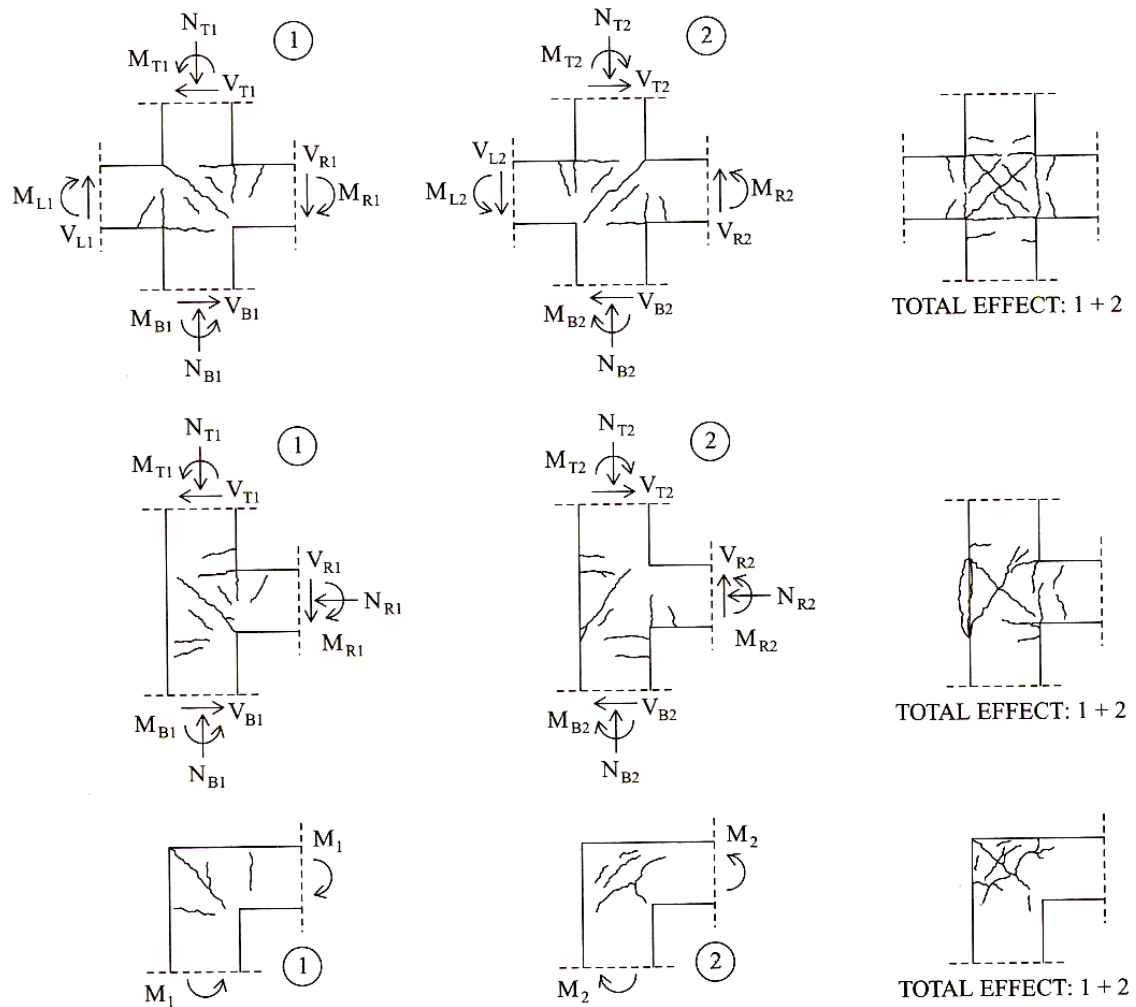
Lateral damage patterns of beam-to-column and column-to-foundation joints (Penelis and Kappos, 1997; Elnashai and Sarno, 2008).
